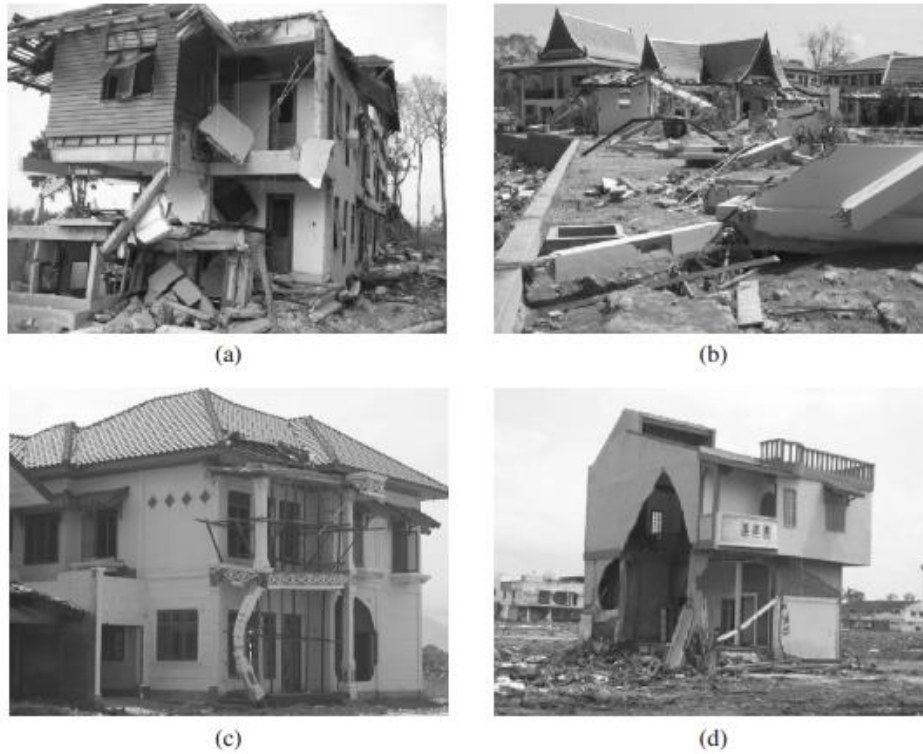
Tsunami damage in Thailand and Indonesia (December 2004 Indian Ocean tsunami): (a) severe structural damage, Khao Lak, Thailand; (b) column failure of a reinforced concrete frame, Thailand; (c) column failure due to debris impact, Banda Aceh, Indonesia; (d) failure of infill walls, Banda Aceh, Indonesia. (after Nistor et al. 2010)
